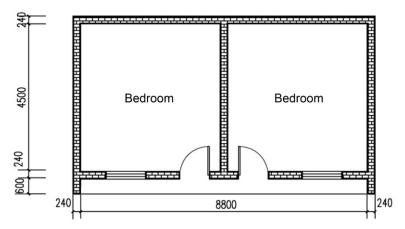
Planning drawing of the one-storey brick-concrete structure building
